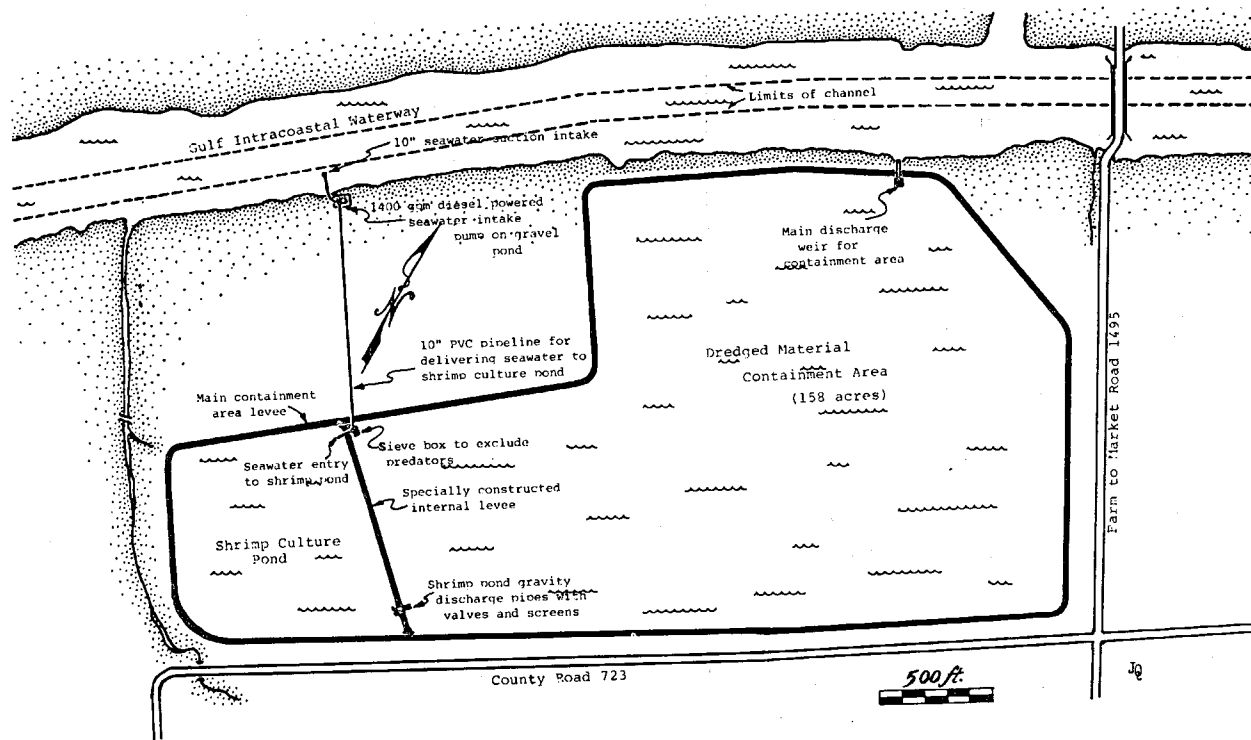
Galveston District dredged material Containment Area No. 85, showing shrimp pond, internal levee, and associated structures.
